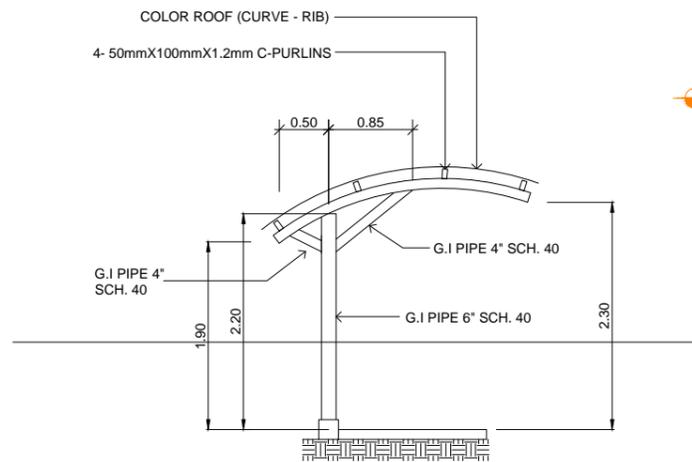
DETAIL "A" TYPICAL CURVE TRUSS (CT) DETAILS
